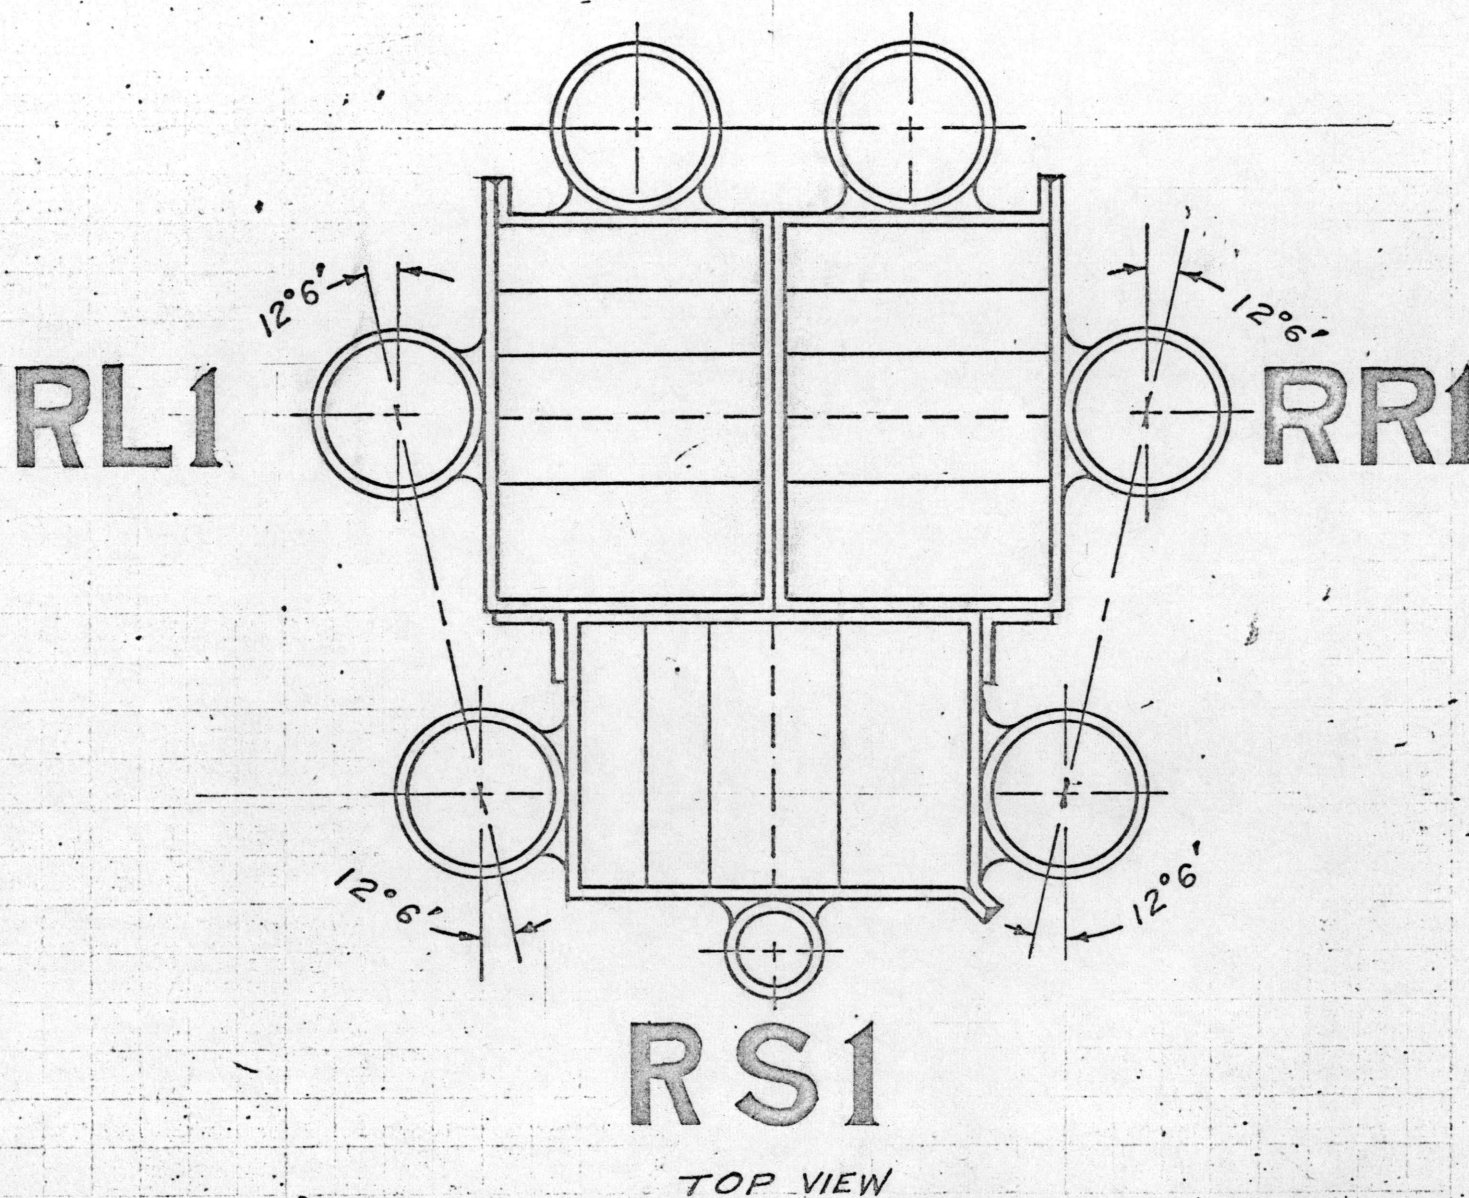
Top View of MSRE Reactor Core Specimens of Stringers: RS1, RR1 and RL1
